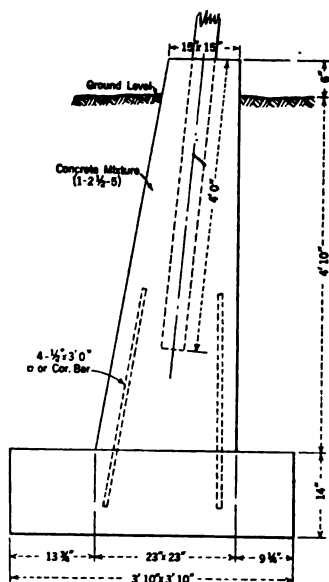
CONCRETE FOOTING FOR 75-FT. DOUBLE CIRCUIT LINE TOWER
